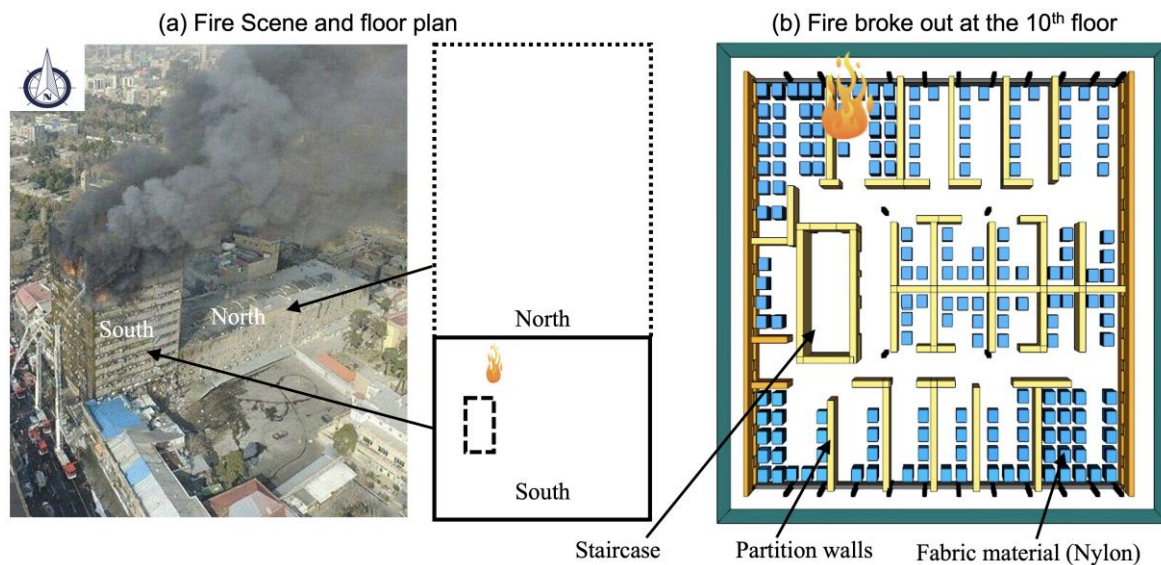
Detail of the Plasco Building and computational domain ($34 \times 36 \times 4 \text{ m}^3$) of a typical floor plan.
